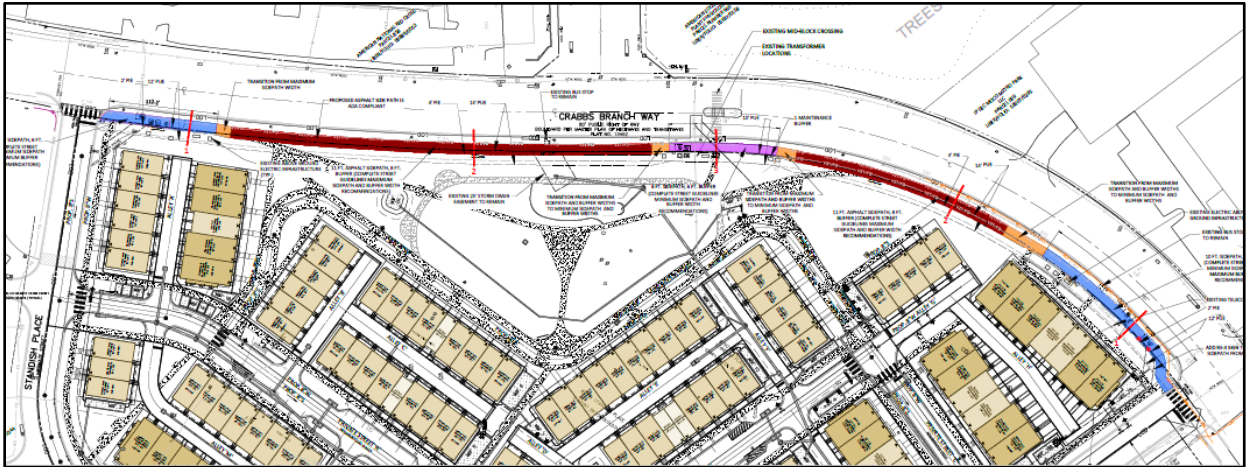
Proposed Asphalt Sidepath with Modified Dimensions, as approved by MCDOT.
